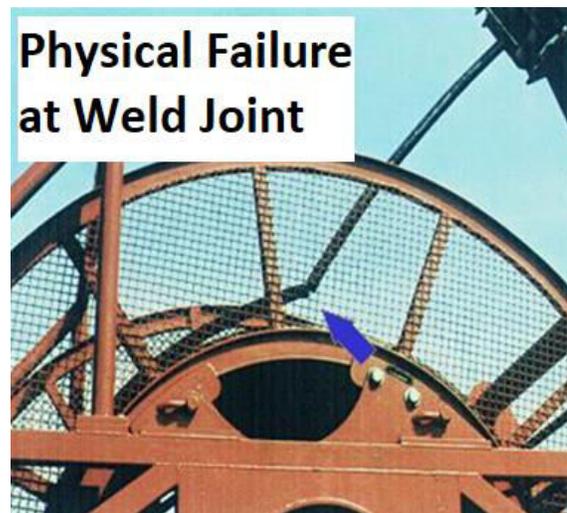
Failure due to Physical Failure at Weld Joint
